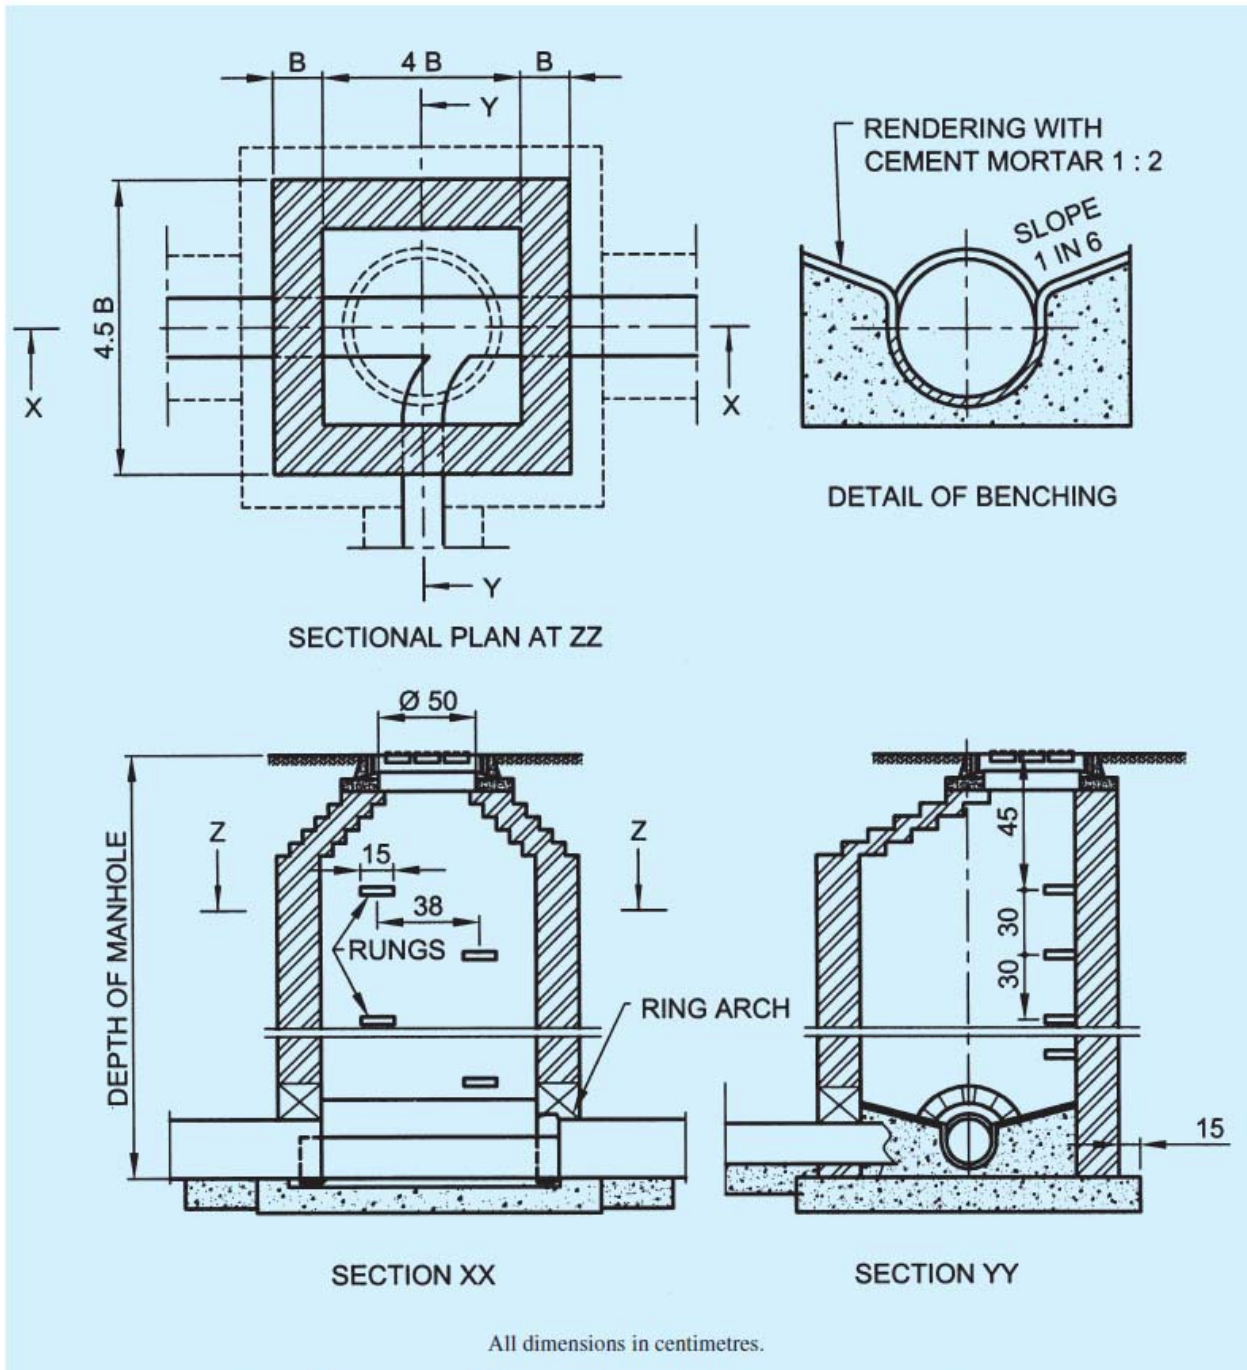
DETAIL OF MANHOLE (DEPTH FROM 0.9 m AND UPTO 2.5 m)
